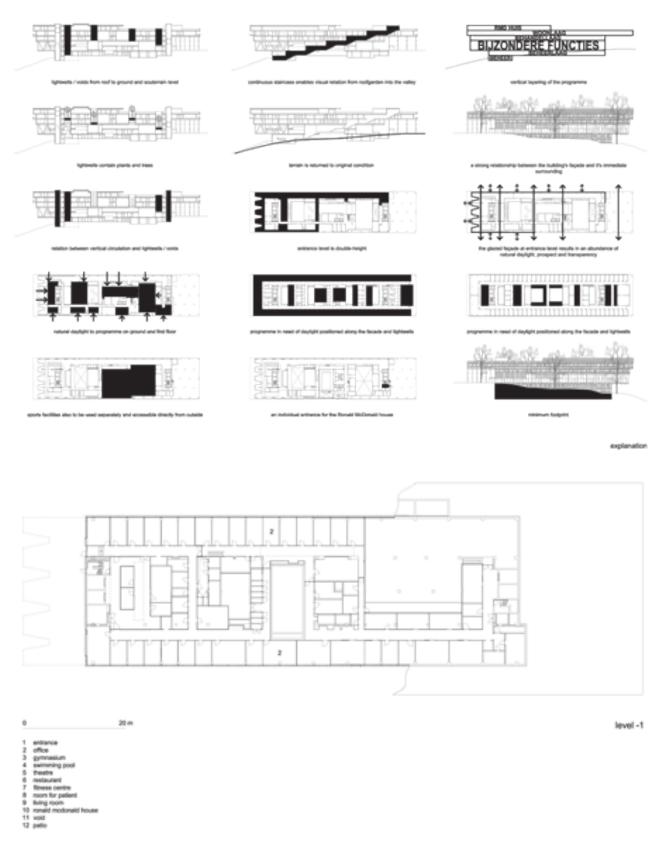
e::Concept formation and ground floor plan (source:arch20)
